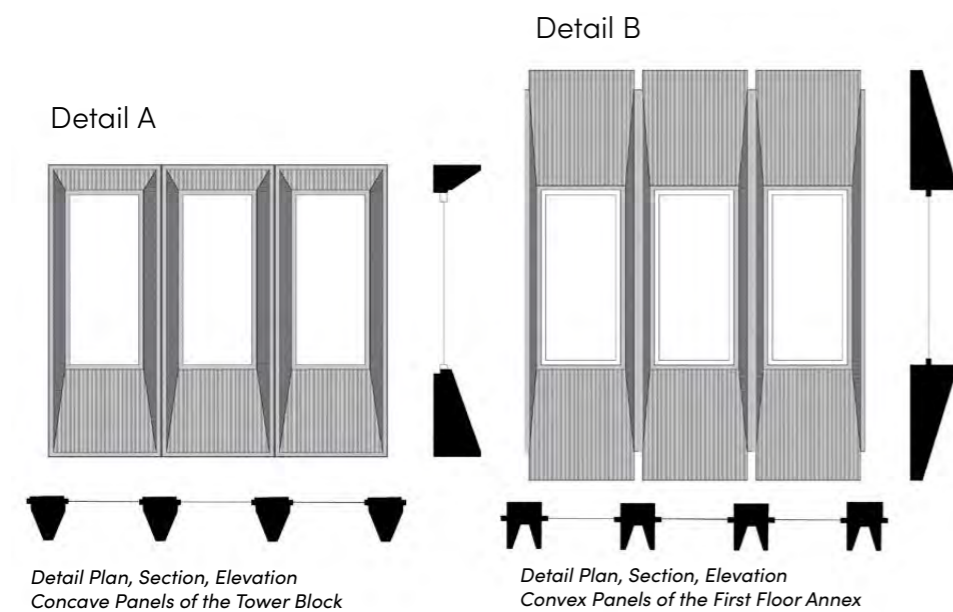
Detail plans, sections and elevations of current concrete elevations. Source: MCORM, 2026.
